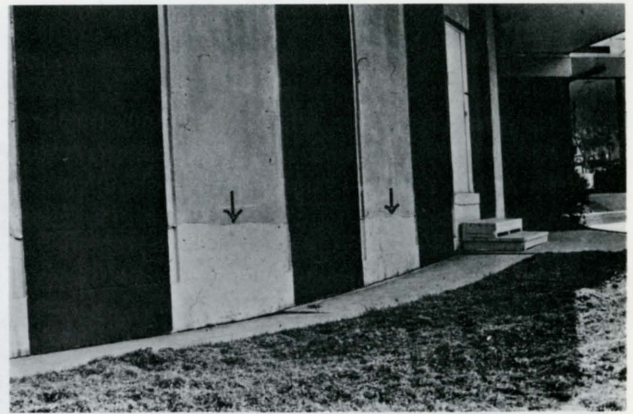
Church shown in Figure 14B showing three ft (1 m) of subsidence of ground surface on outside of building. Original ground surface marked by arrows. Note the temporary stair box below the exit. (Photo taken in April, 1980.)
